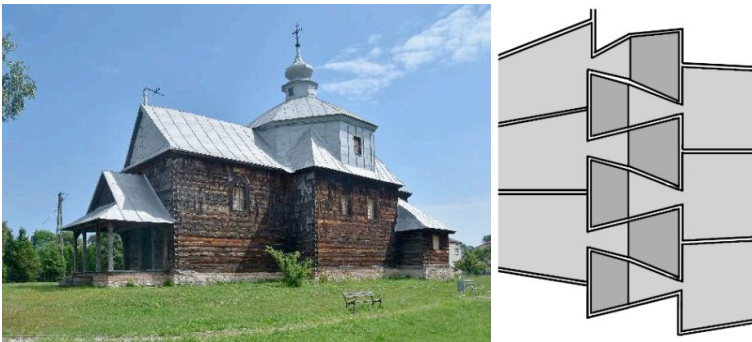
The Church in Cewków, Poland (left) (Source: Wikipedia) with dovetail corner detail (right)
